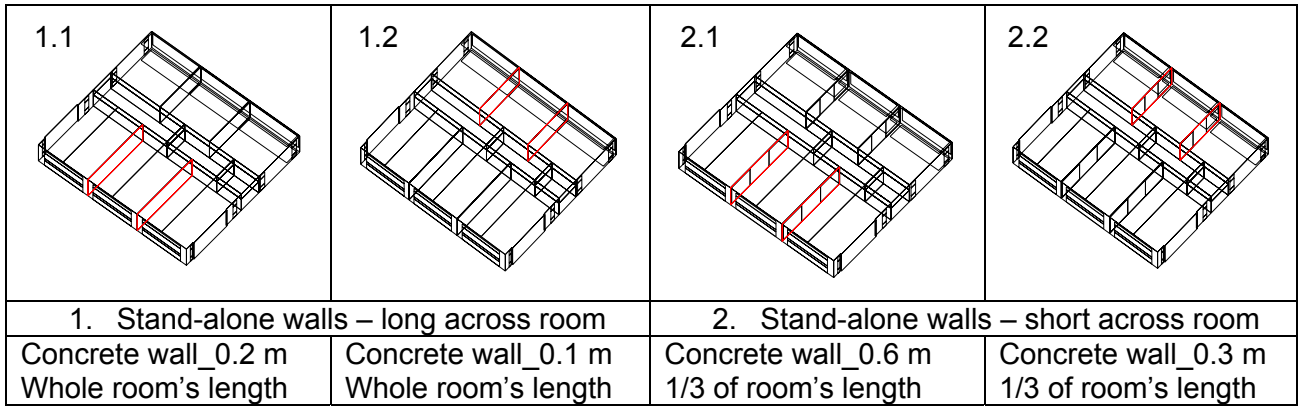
Stand-alone walls (in red) type and placement in Level 2 of the Test building.
